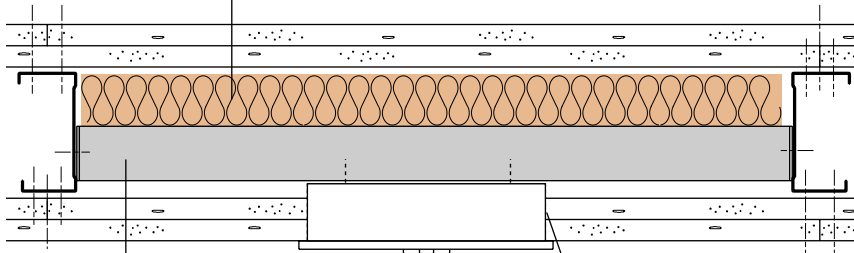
Socket box/switch detail providing up to 60 minutes fire resistance (cross section view)
